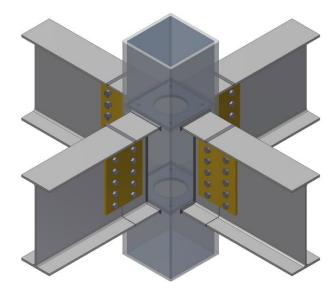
Steel beam to column moment connection with internal diaphragm plates
